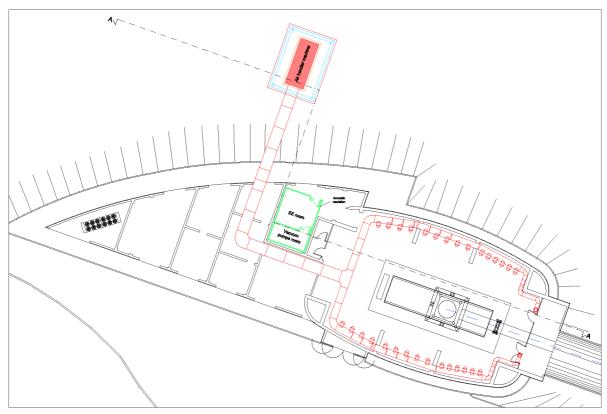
Plan view of the WEB (Alternative solution 2)
